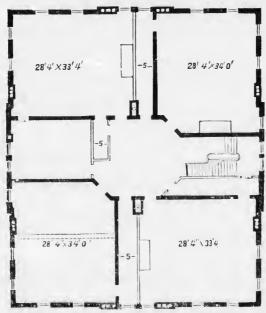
Plan of Second Floor, adapted to Fig. 160.
